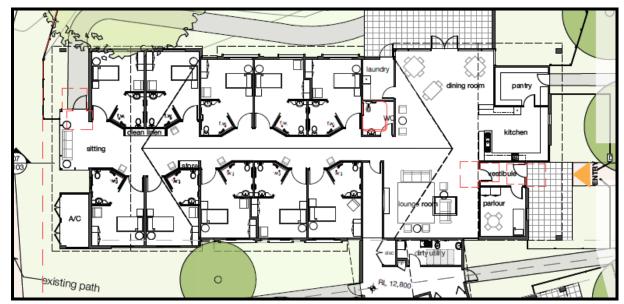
Ground Floor Building 5, typical floor plate for B2, B3, B5, B6, B7 and B8
